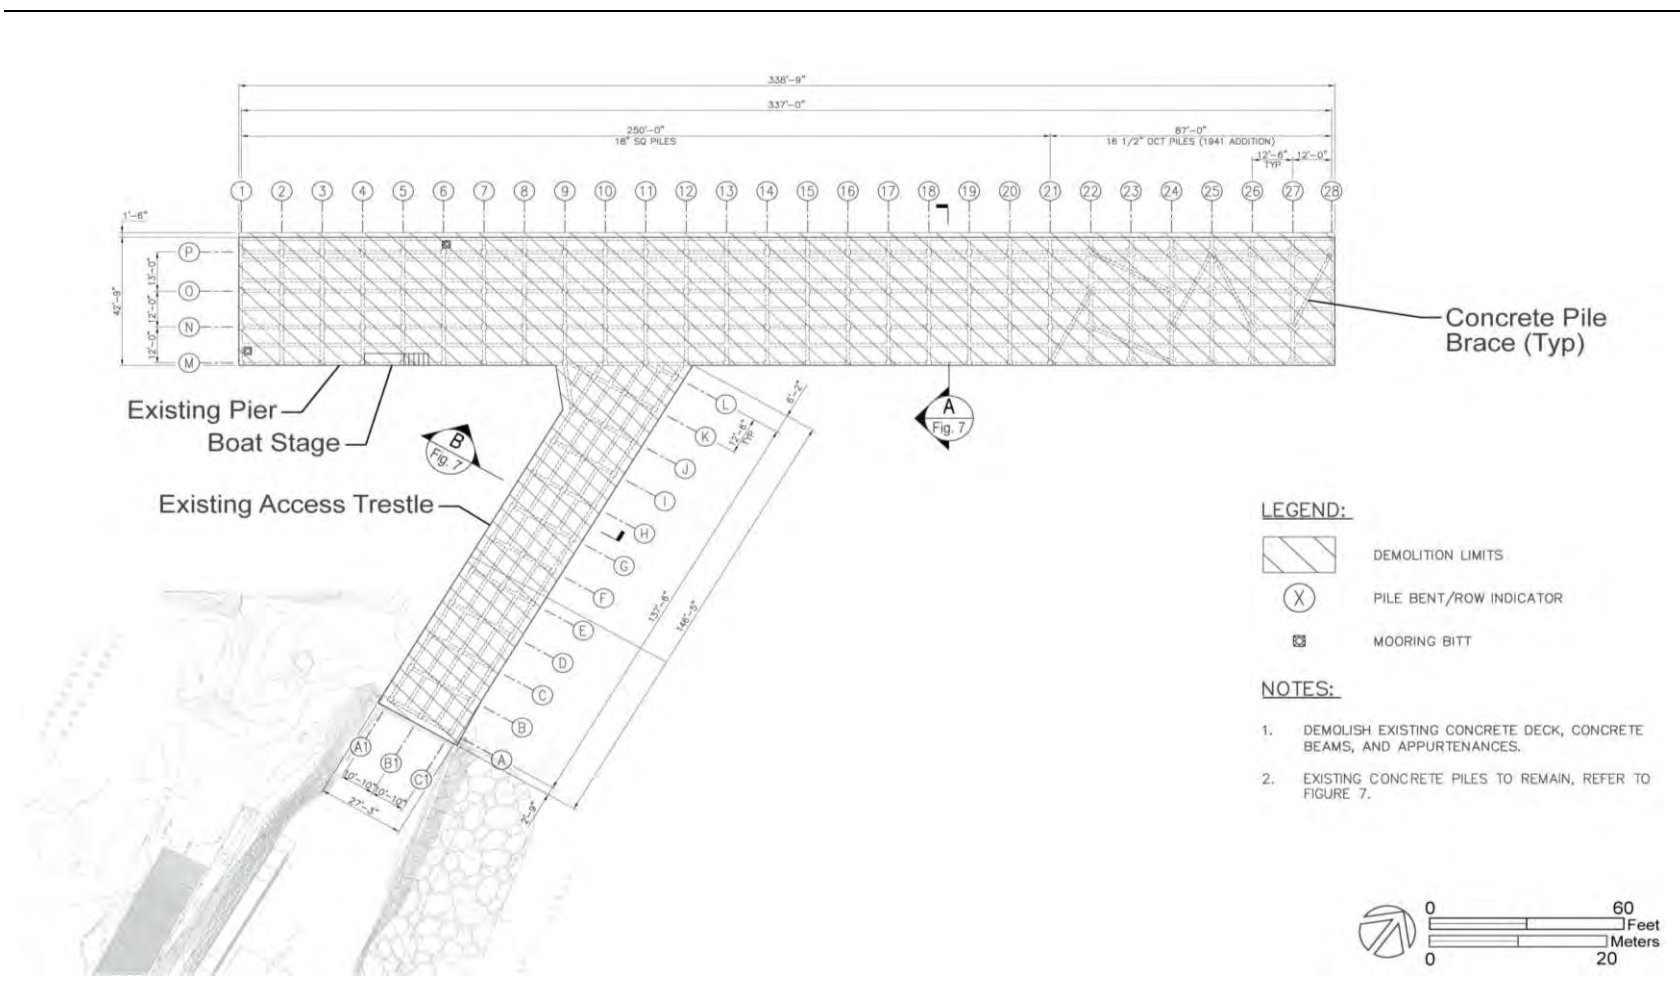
Proposed demolition plan for Hana Pier (Moffatt & Nichol, 2016).
